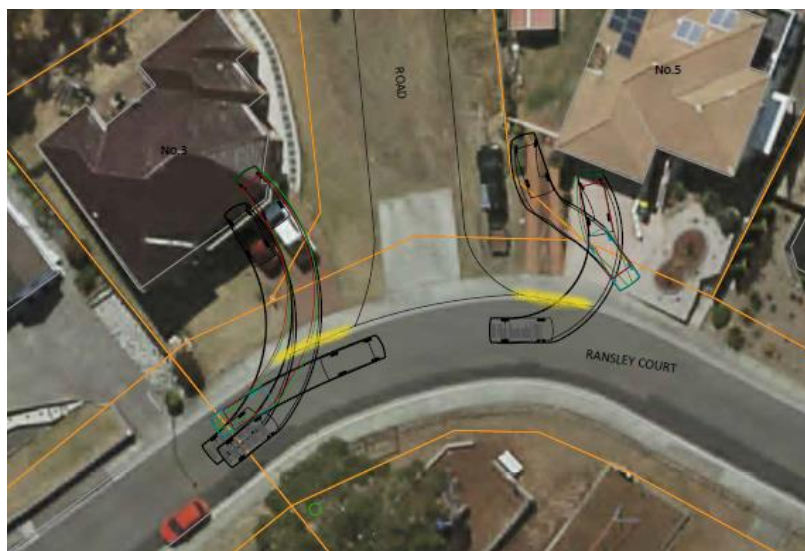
Driveway Access to 3 and 5 Ransley Court
